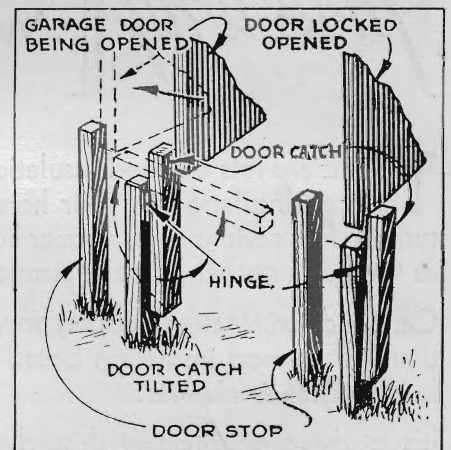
Hinged sticks set at side of garage door, as shown above, will make a simple door stop.
